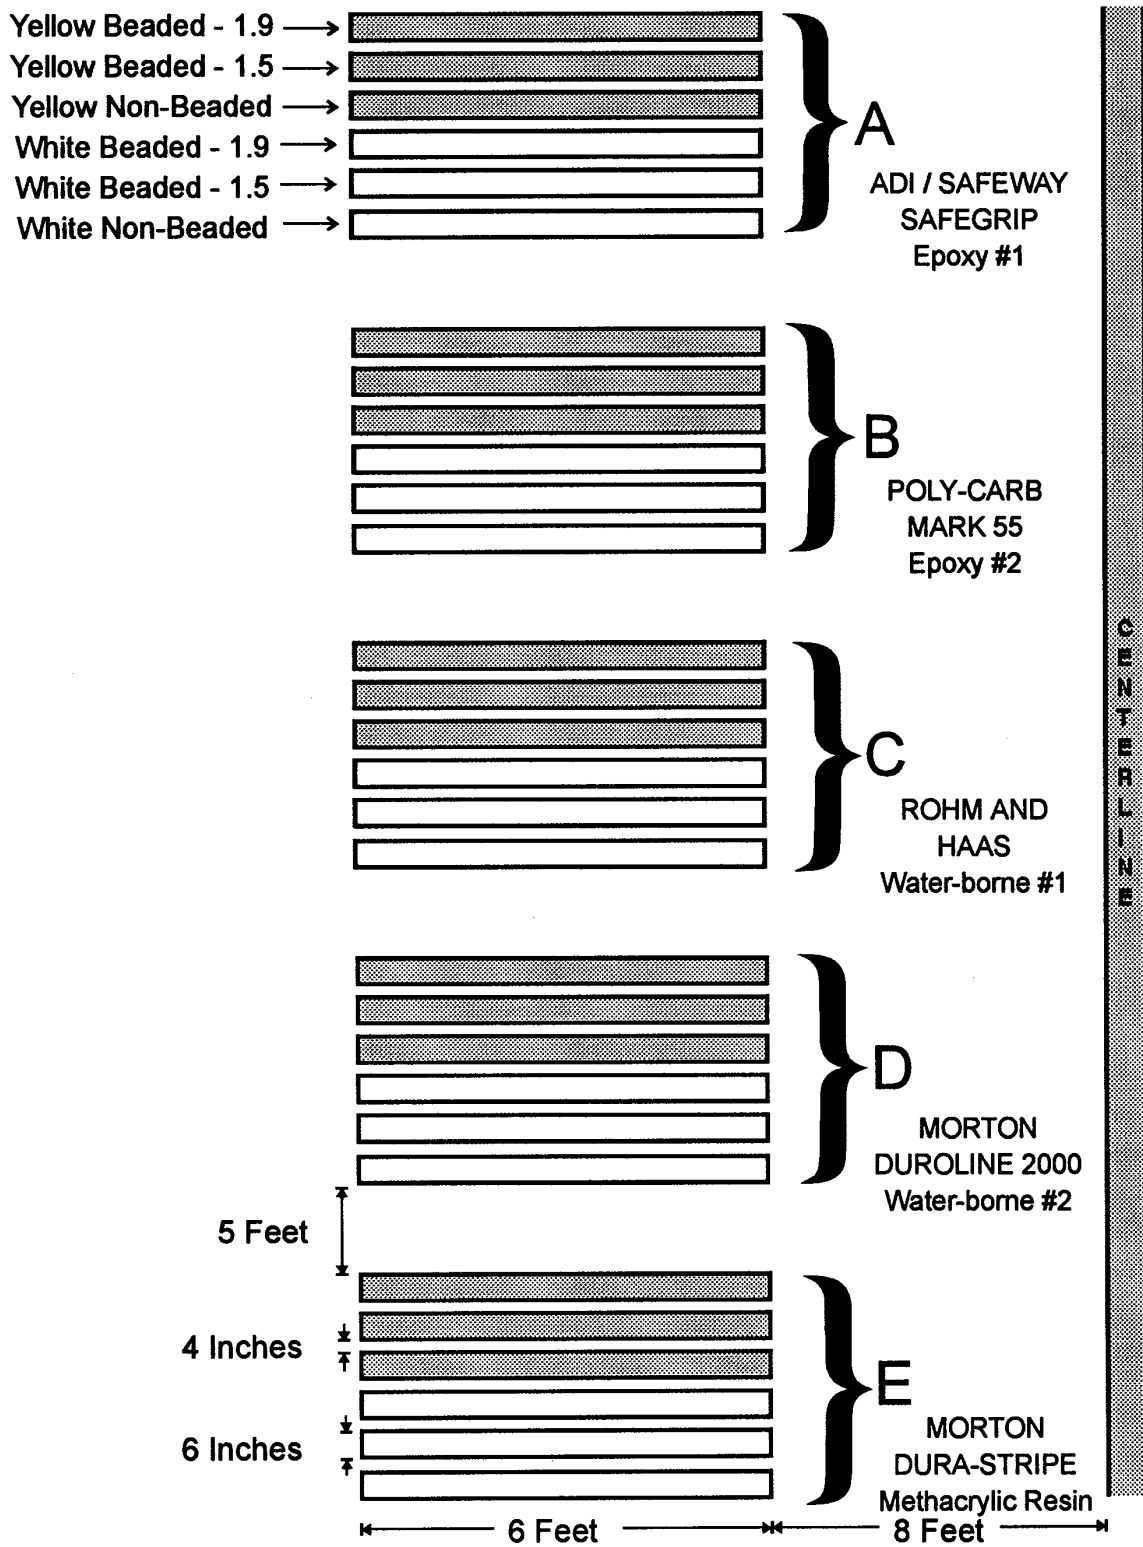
TAXIWAY MARKING TEST LAYOUT
